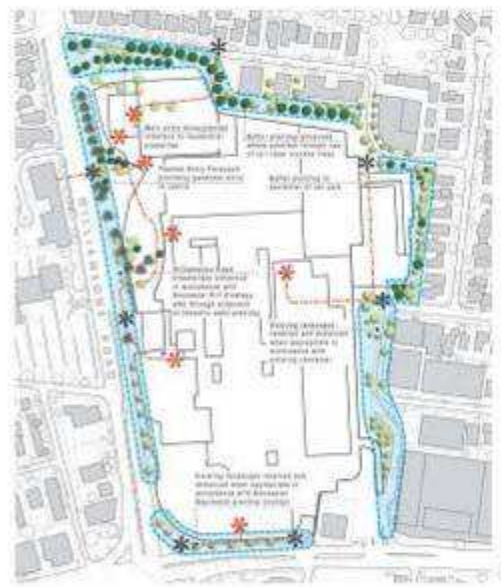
Proposed Landscaping and Public Realm. The plan shows the layout of the landscaping and public realm elements around the building complex.
